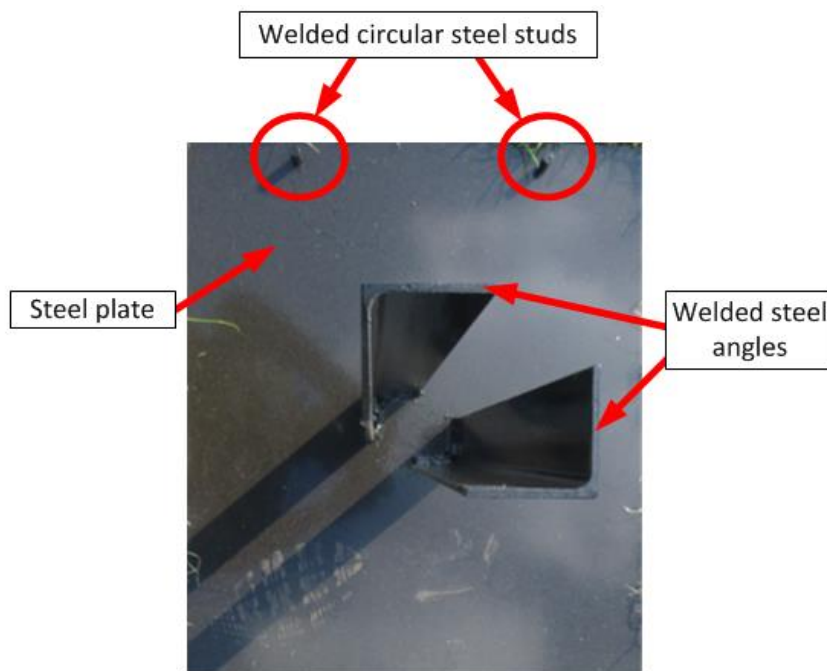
Photographic image of a top-down view of a steel plate with welded steel angles and circular steel studs
